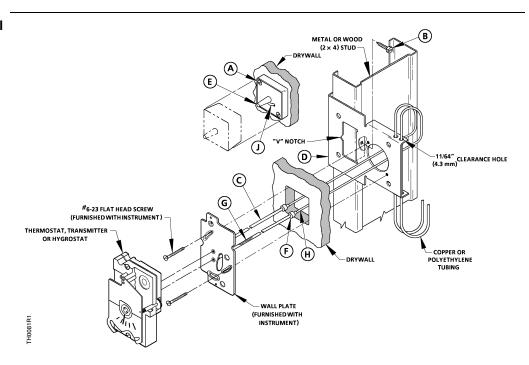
Mounting Wall Plate and Instrument with Bracket Mounting Kit.
